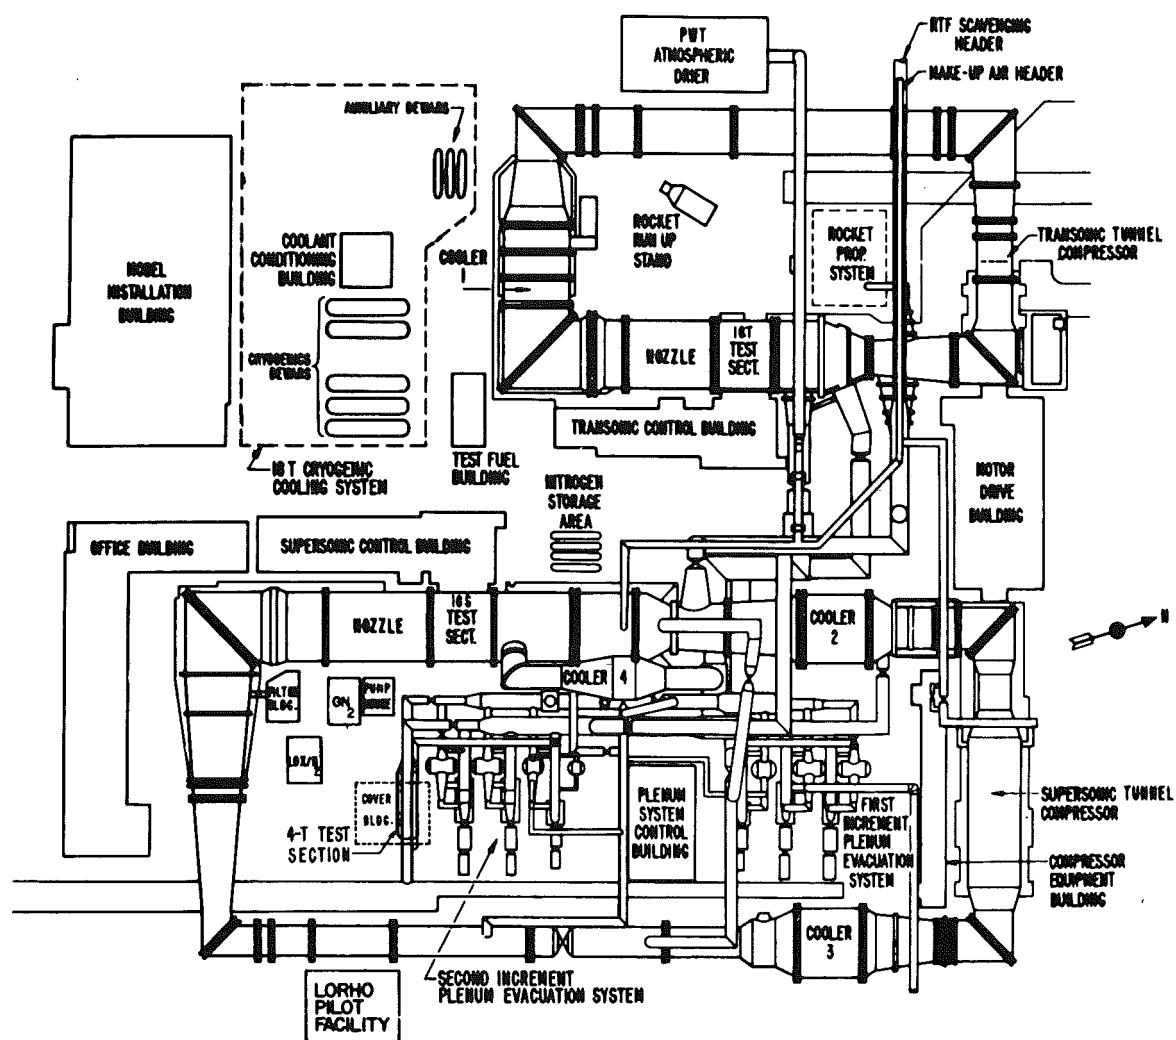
General Arrangement of the PWT 16-Ft Tunnels
